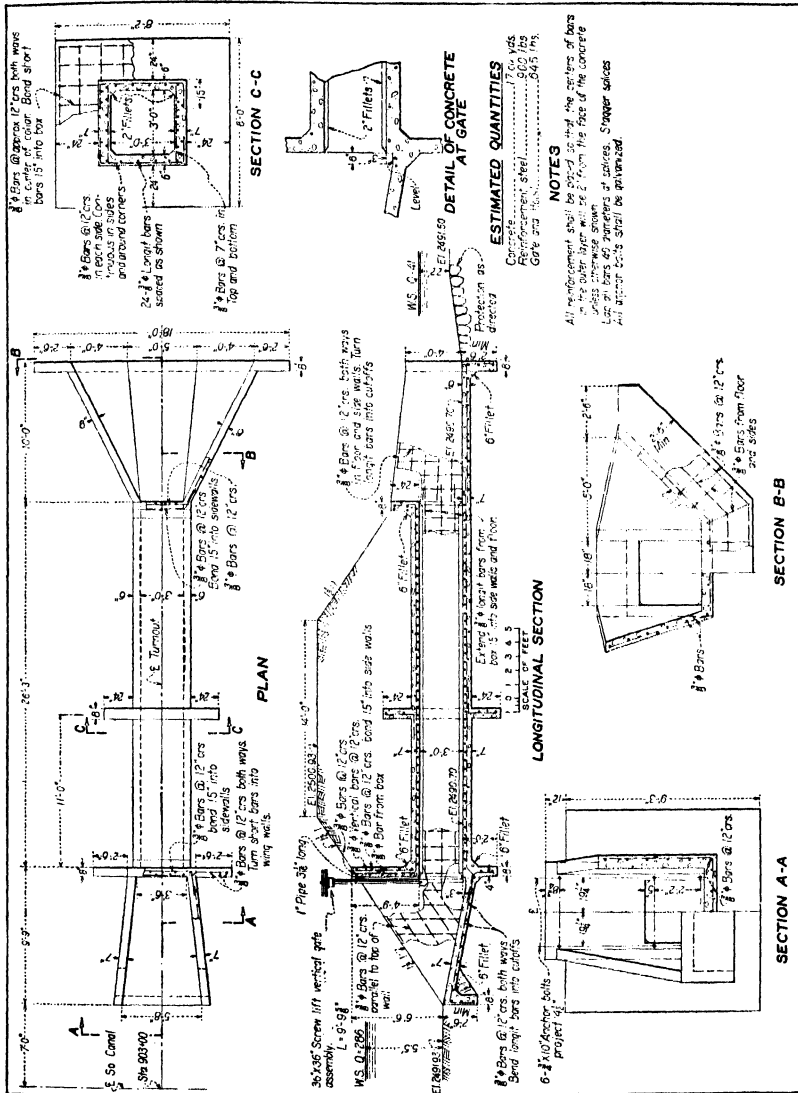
Concrete box turnout, Owyhee project, Idaho.
